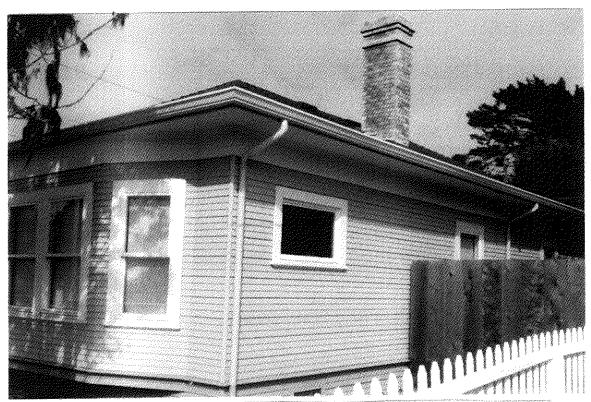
Looking NE at the SW corner of the residence, note small window for full scale window replacement, & its reuse on this same elevation, April, 2015.
